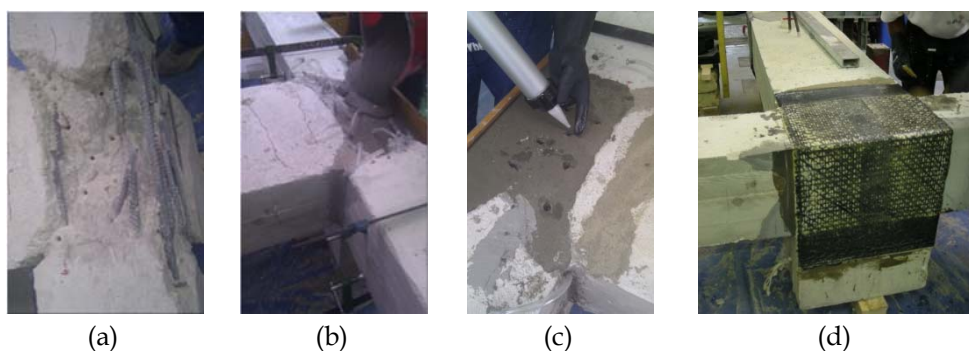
Repair and retrofit of specimen T_RFL1: concrete cover and damaged concrete removal (a); controlled-shrinkage fiber-reinforced fluid mortar casting (b); super fluid epoxy resin injection (c); and FRP panel installation (d).
